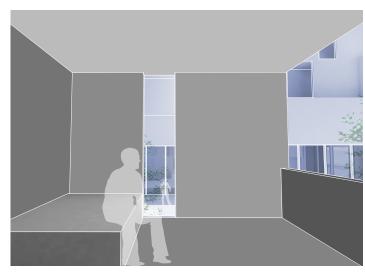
Interior Perspective of Unit B108 Level 1 kitchen/living room facing out toward garden.
